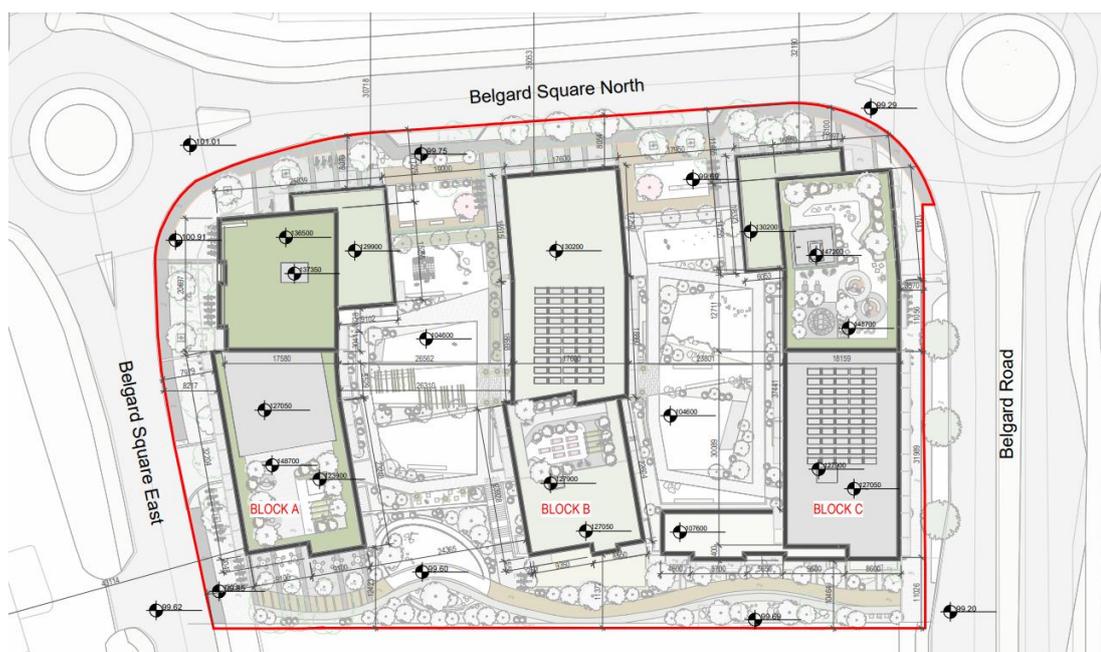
Proposed Site Layout Plan (Source: C+W O'Brien Drawing Register PE19150-CWO-ZZ-00-DR-A-0103)
